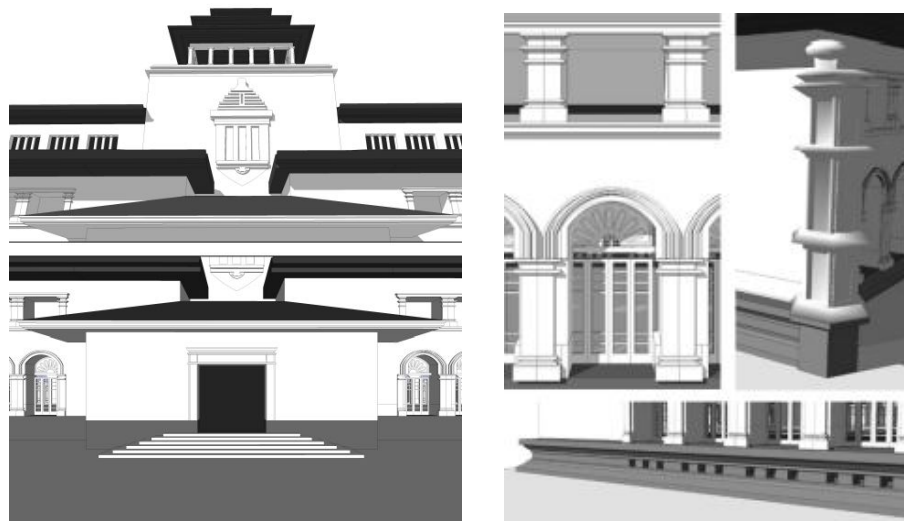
(a): Area around entrance, (b): Opening detail, wall ending detail, pedestal detail [15]
